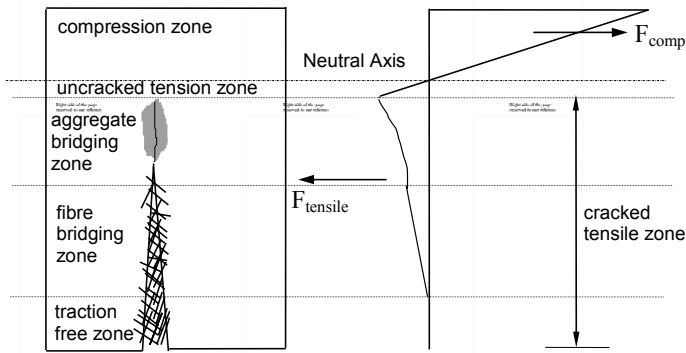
Schematic representation at the cracked section of steel fibre reinforced concrete beam under flexural loading.
